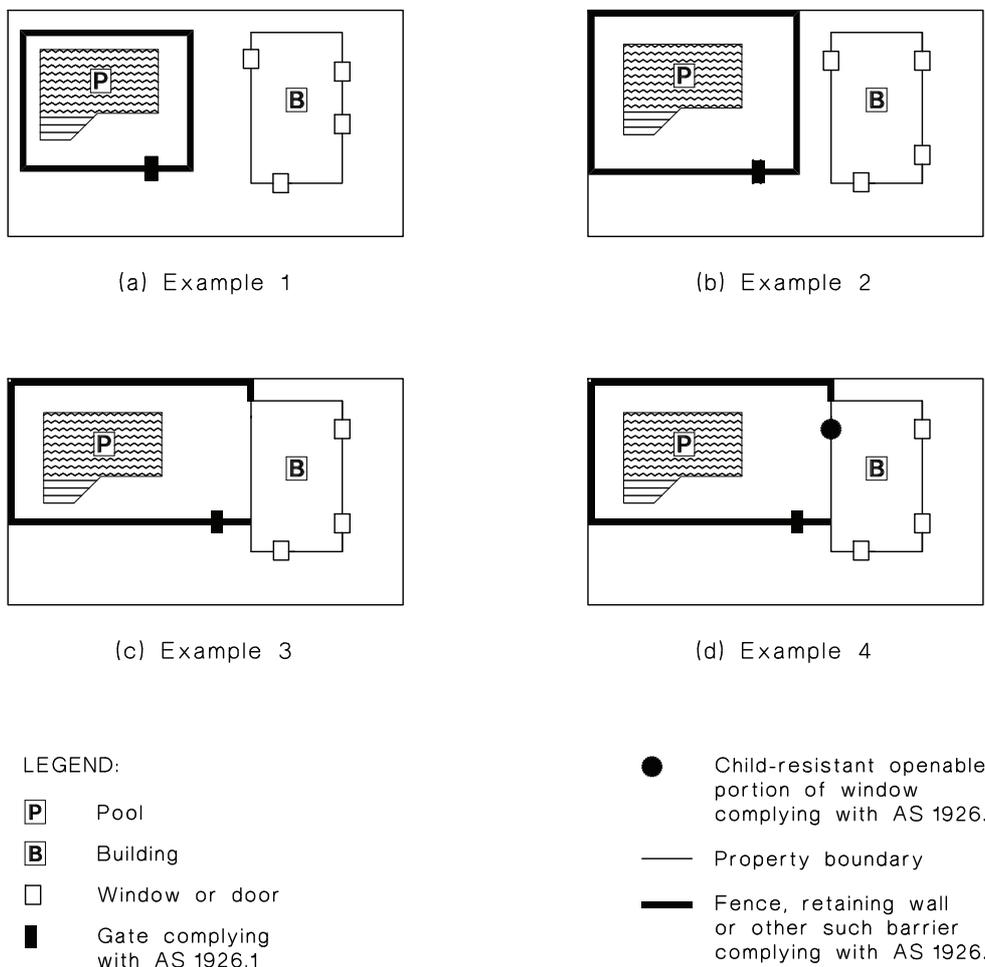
TYPICAL EXAMPLES OF OUTDOOR POOL BARRIER LOCATIONS
